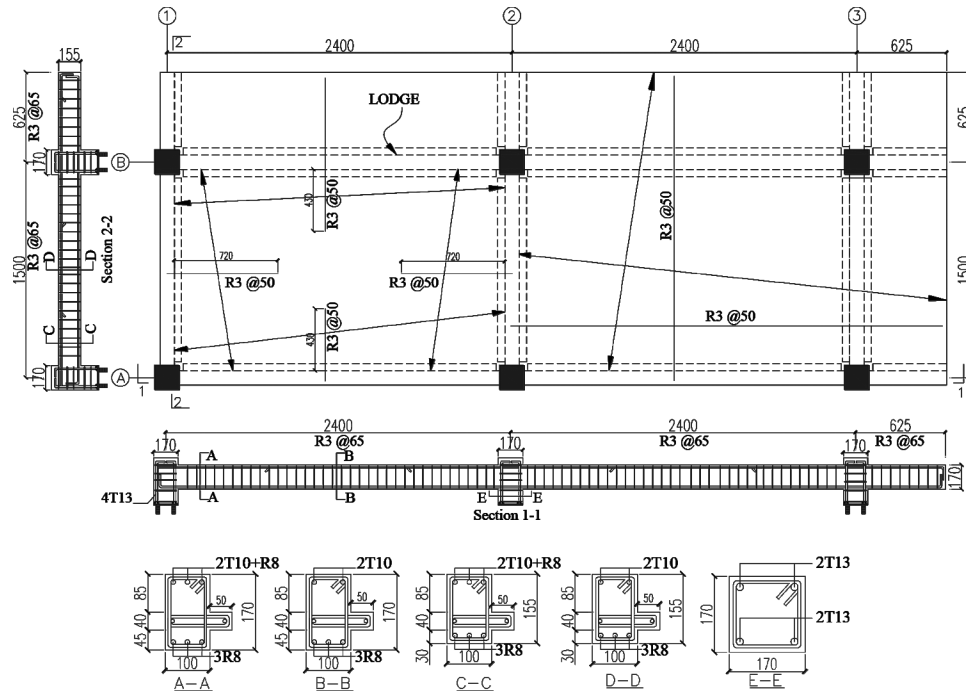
Details of control Specimen RC1. (Note: Units in mm; 1 mm = 0.0393 in.; T is deformed reinforcing bar; R is plain reinforcing bar)
